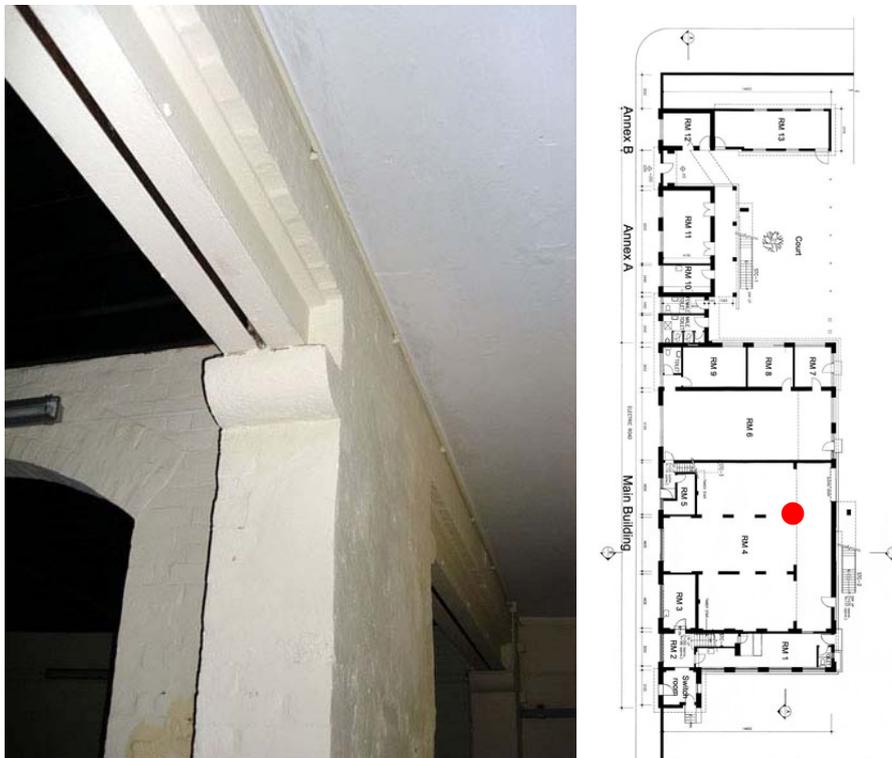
Bracket supporting steel beam at RM 4 of the main building.
